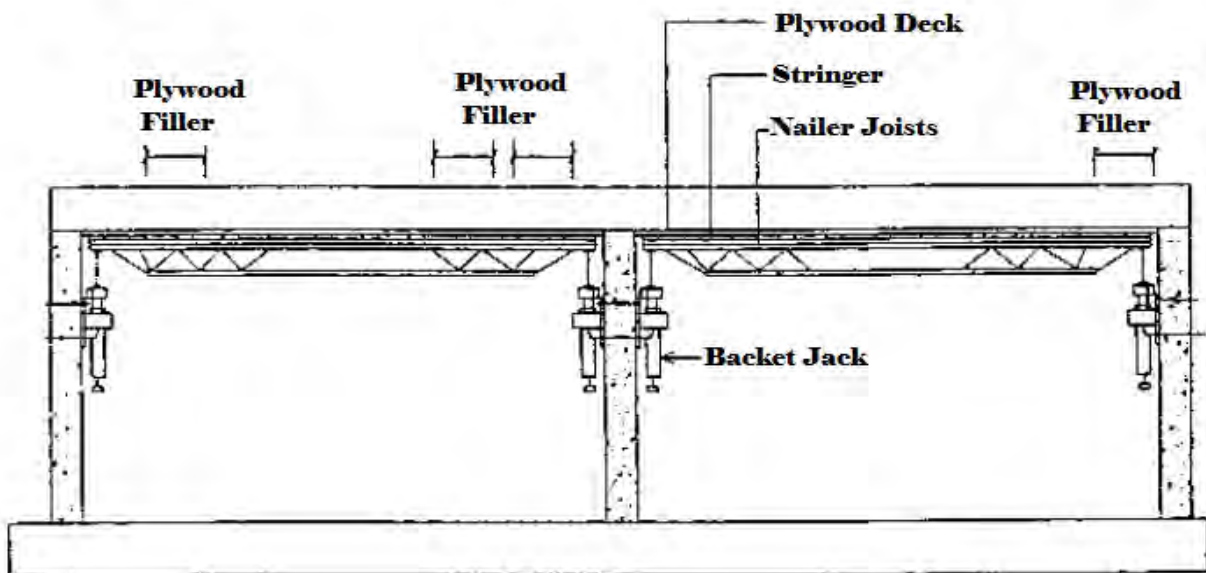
Column-Mounted formwork system (Awad S.Hanna,1999)
